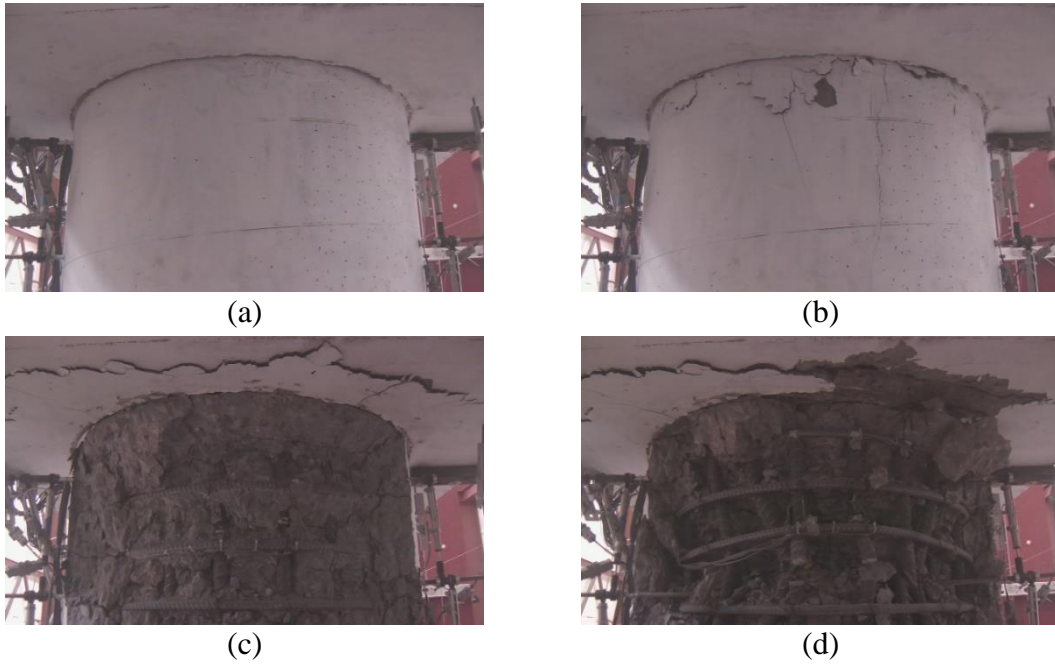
North Face of Column Plastic Hinge at Key Points During Test: (a) Concrete Flaking; (b) Concrete Spalling; (c) Reinforcing Bars Exposed; (d) Severe Buckling and Bar Fracture
